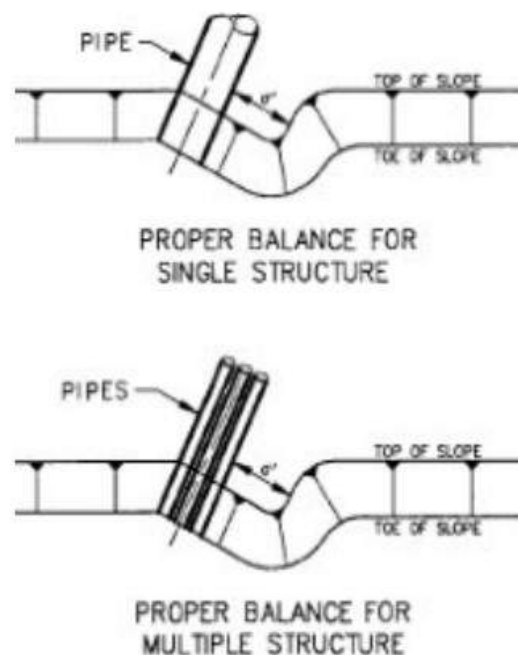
End Treatment of Skewed Flexible Culvert
